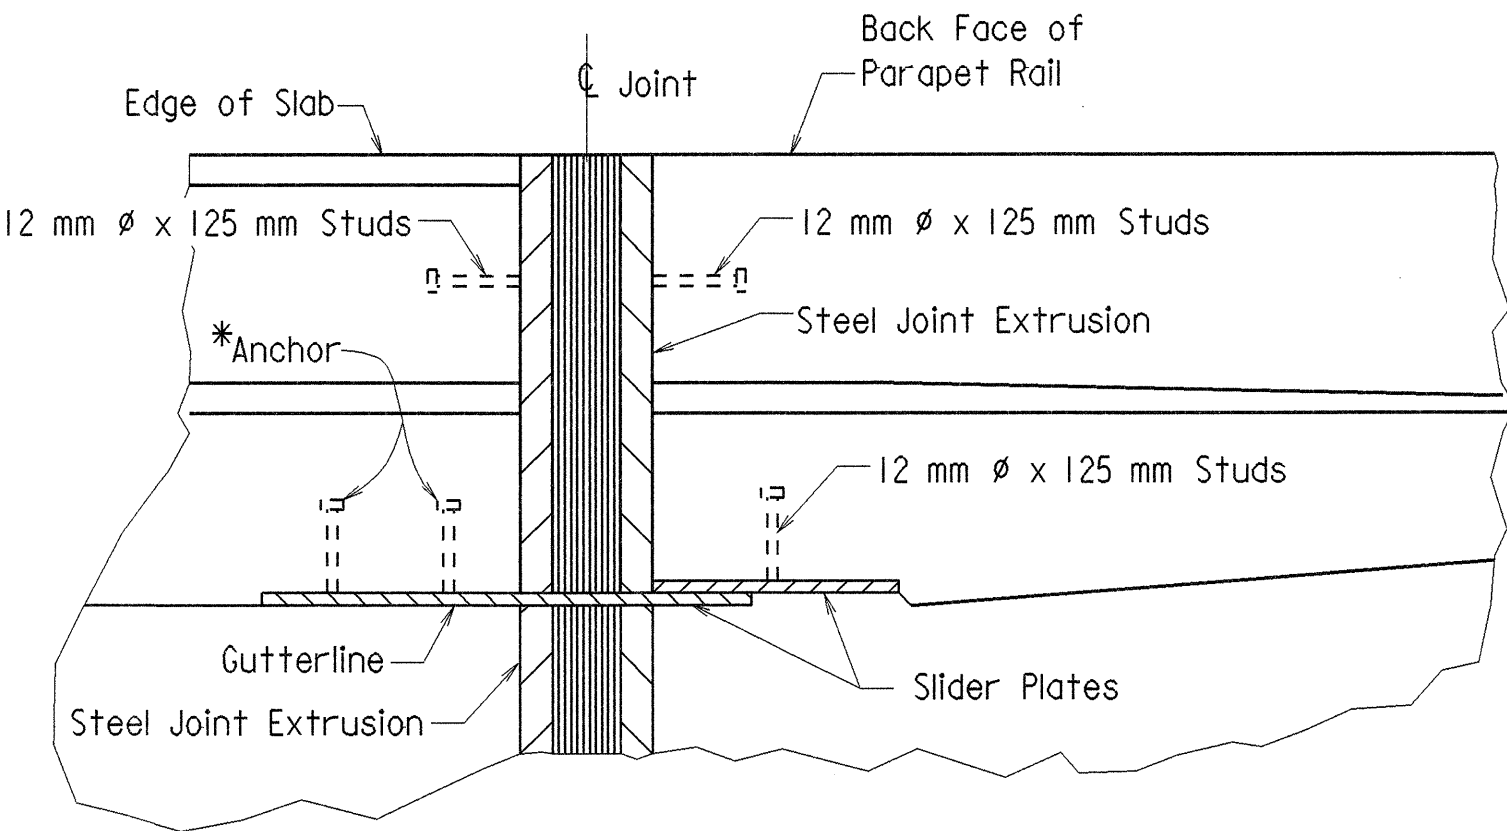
DETAILS FOR BLOCKING EXPANSION JOINT DEVICE
